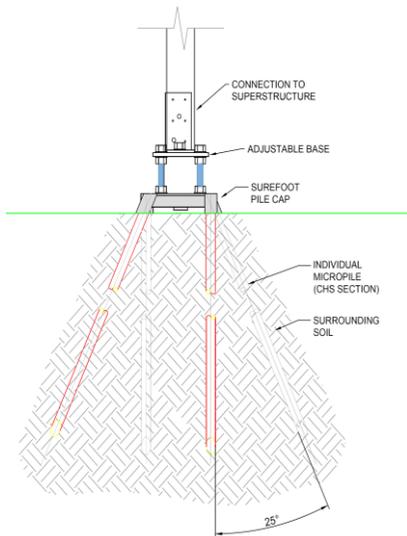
Installed footing in the ground (After Mehdizadeh et al., 2016)
